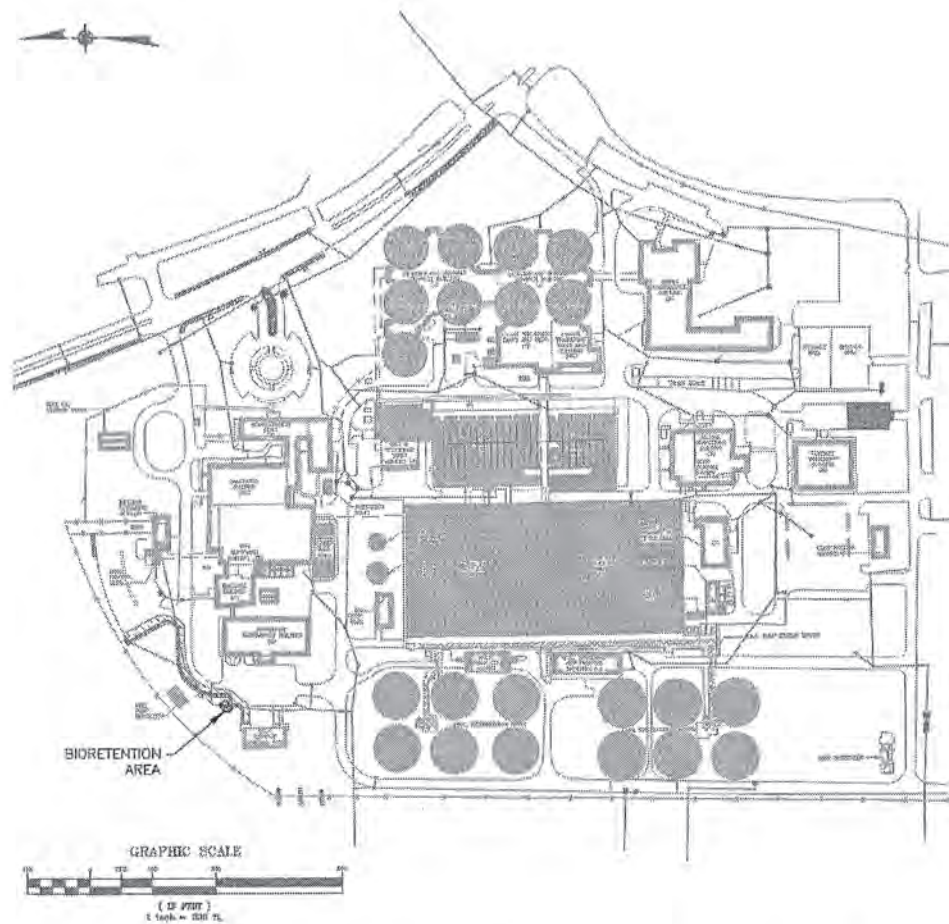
Cedar Creek WPCP Bioretention Area Site Plan
